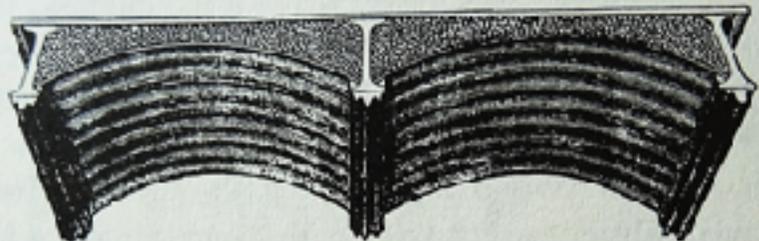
Cross-section through a floor consisting of a corrugated iron arch filled with concrete, patented by Joseph Gilbert in 1867. This kind of floor continued to be used through the end of the nineteenth century. *Architectural Review and American Builders' Journal* 1 (July 1858).
